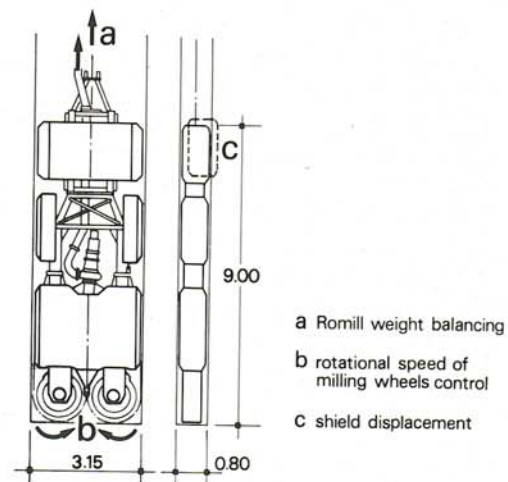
Drawing of Romill, showing the directional drilling capabilities
